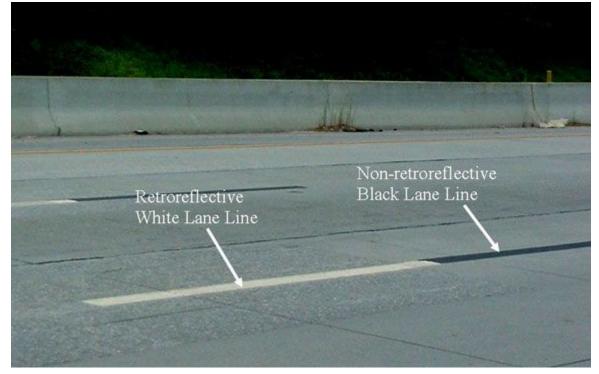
Typical contrast pavement marking for lane (line lead-lag layout).
